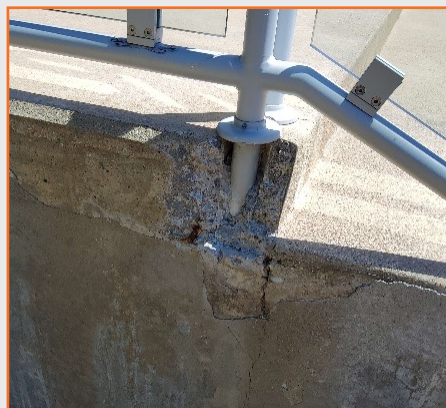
Gleneagles 5900 Plano Parkway handrail base spall.
